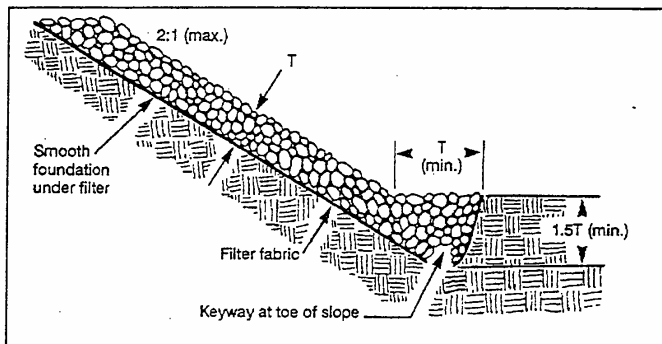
Construction of a riprap bank with toe protection (Source: Indiana Erosion Control Handbook)
